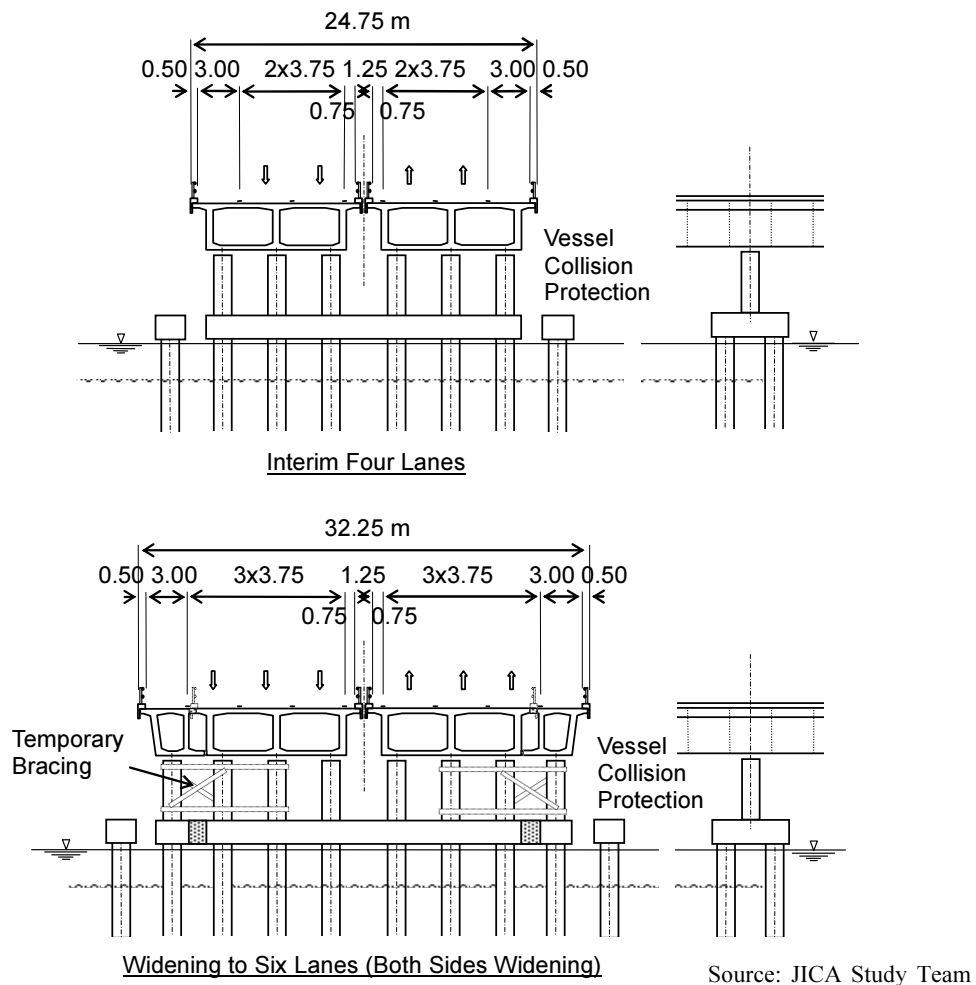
Widening Method for Cast-insitu or Segmental Box Girder Bridge
